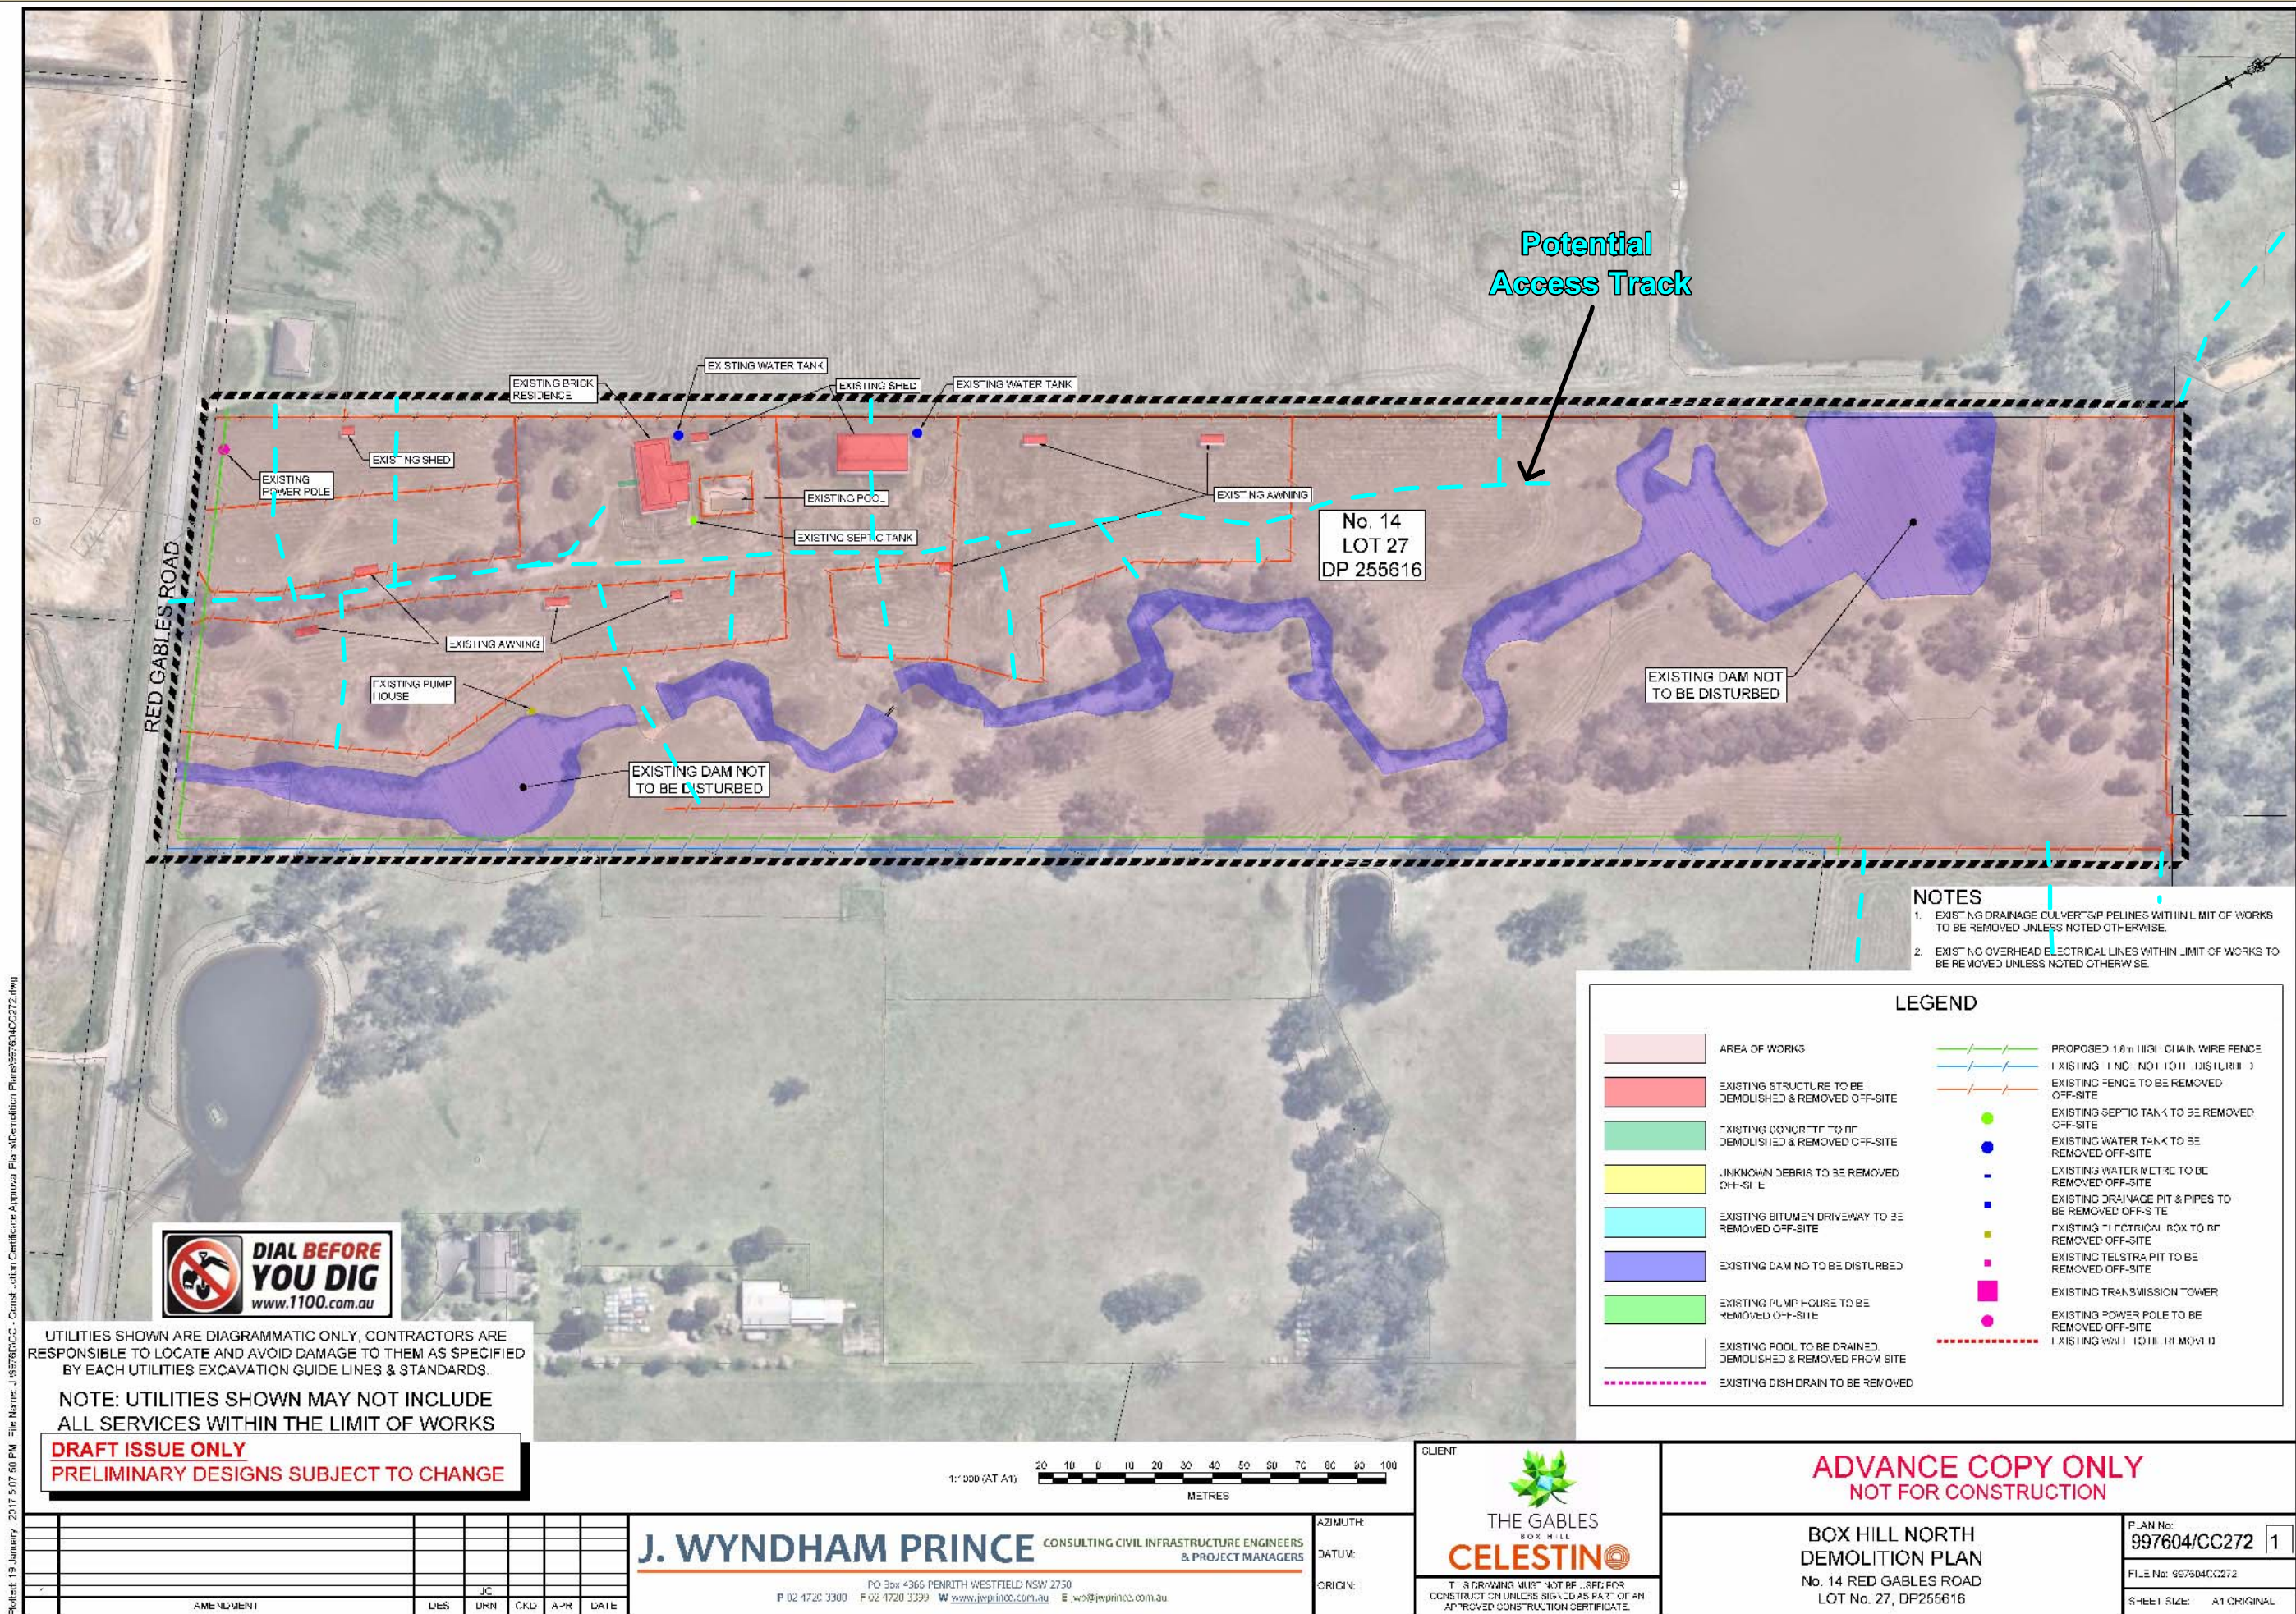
Demolition Sites and Potential Access tracks for 14 Red Gables Road
